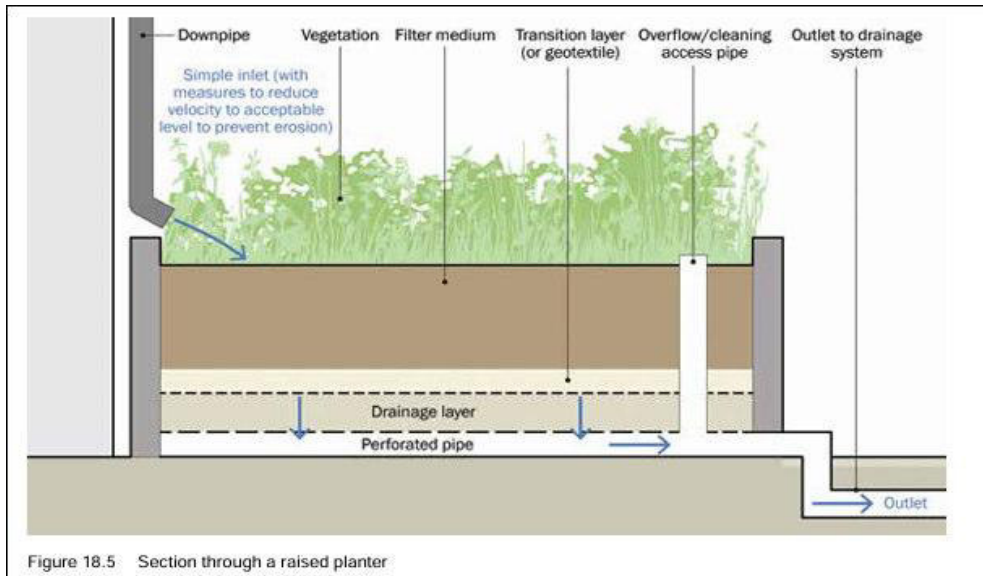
Proposed Downpipe planters (Ciria 753, Figure 18.5)
